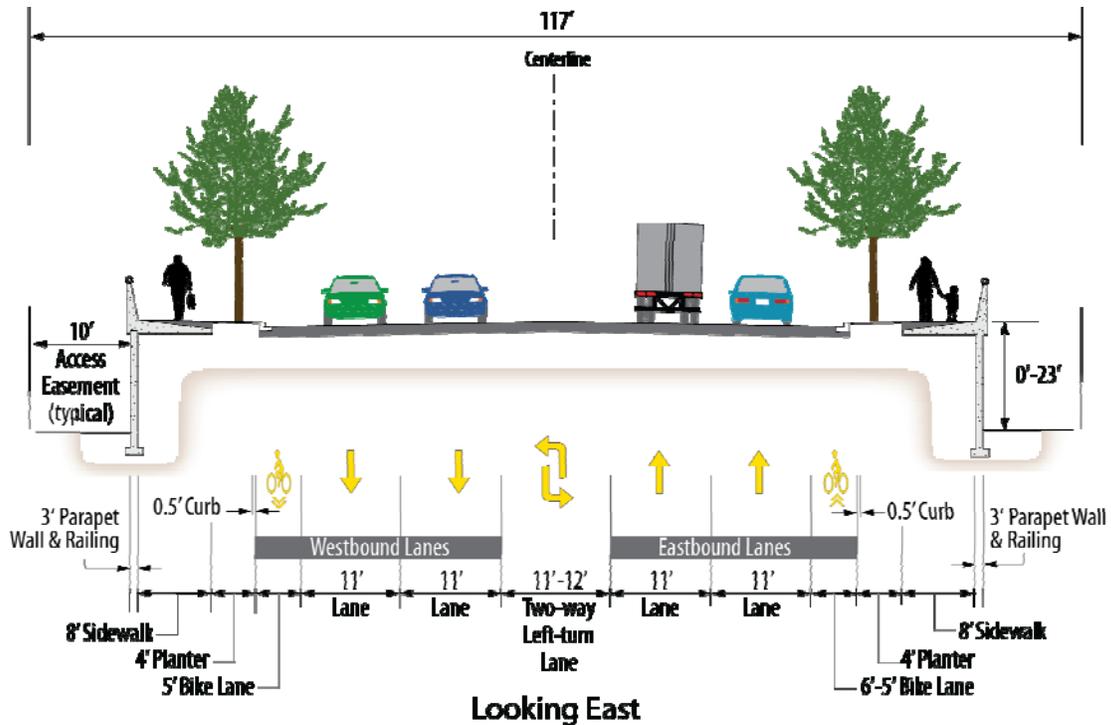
below illustrates a roadway section for a major portion of the extension of NE 4th Street, which would have retaining walls on either side of the five-lane roadway. However, cut and fill retaining walls are proposed at numerous locations throughout the corridor due to changes in elevation on both sides of the roadway. Where retaining walls are required along the corridor, the required right-of-way would need to exceed 105 feet for the five-lane cross-section and 95 feet for the four-lane cross-section as both of the proposed roadway cross-sections include the use of retaining walls. Where retaining walls
